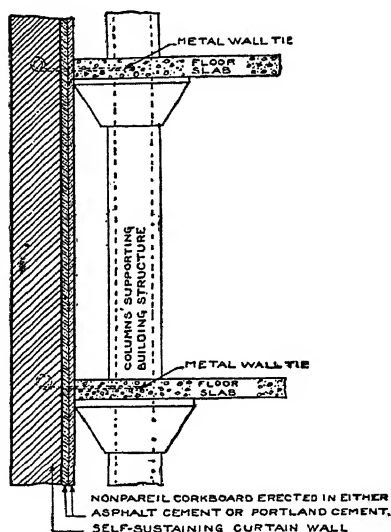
Self-sustaining curtain wall in cold-storage construction.
